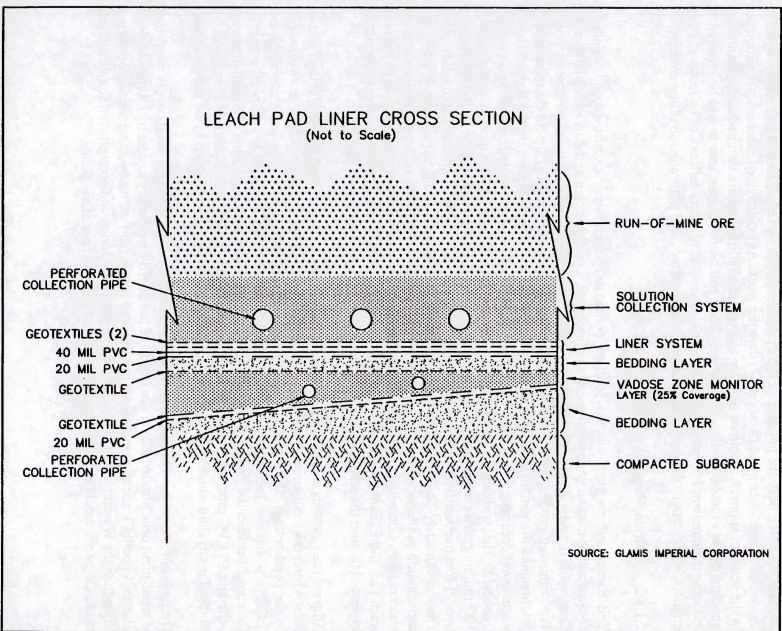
Typical Cross Section of Heap Leach Containment System
